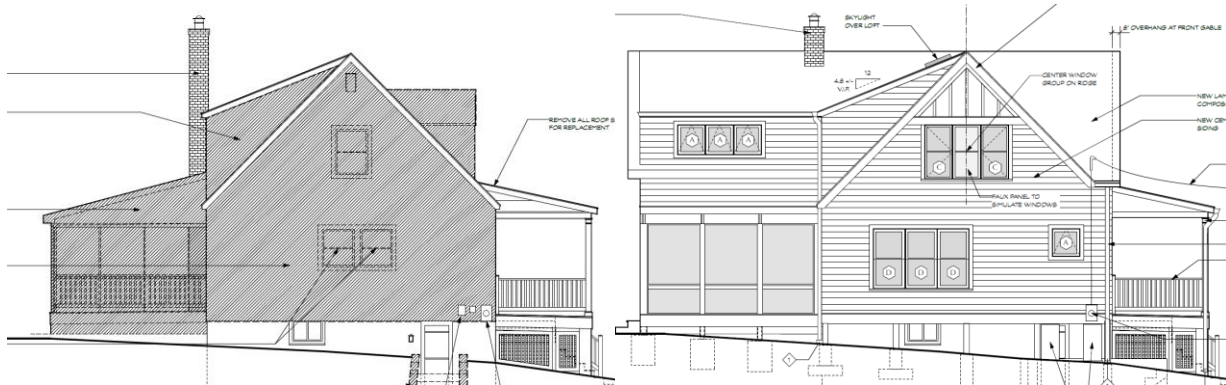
Left side elevation showing the existing screened-in porch (left) and proposed rear addition (right).
